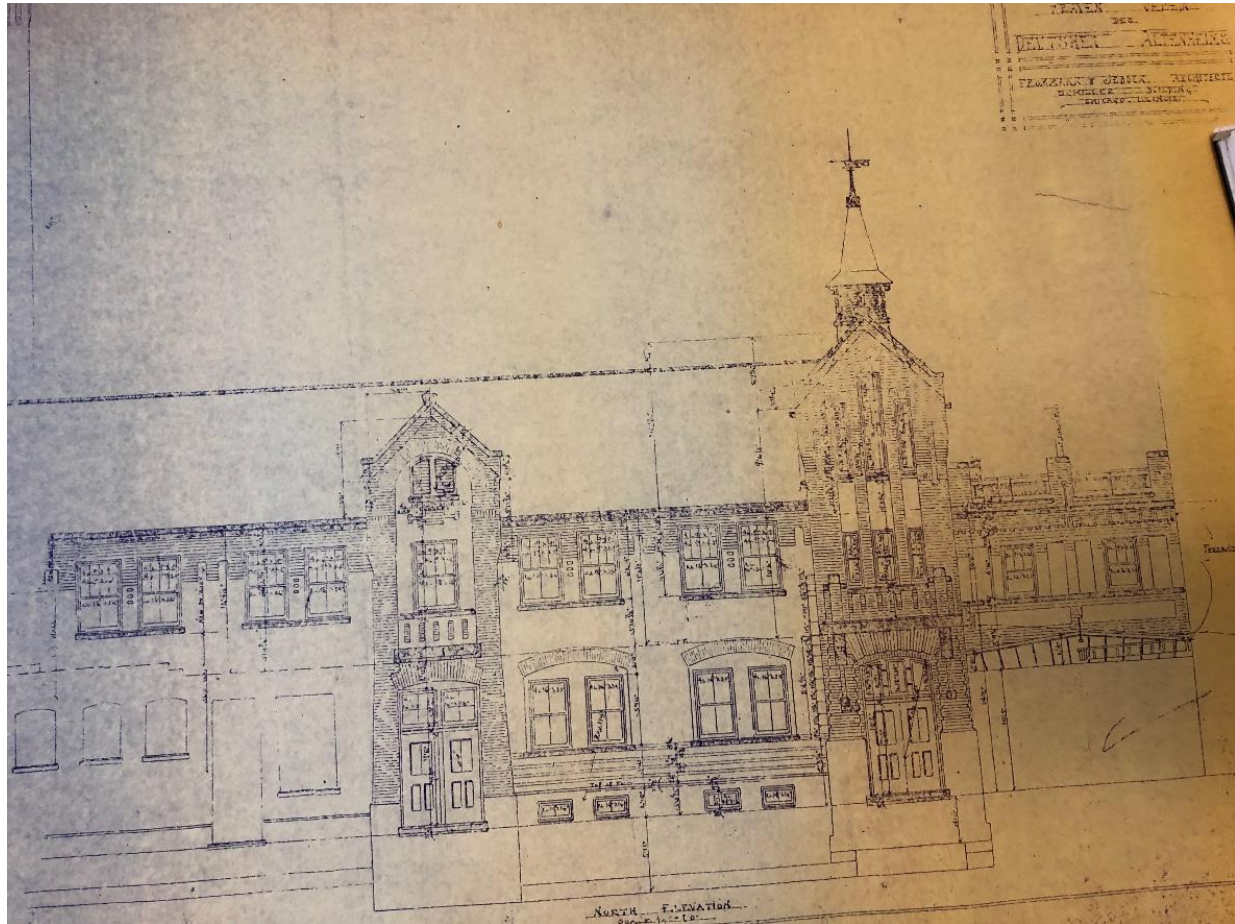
Frommann and Jebson, undated drawing of the north façade of the Laundry/Chapel Building at Altenheim, which the architects label as “Laundry and Meeting Hall.” Drawing was likely made in 1916 after a fire destroyed the original laundry/chapel building.
